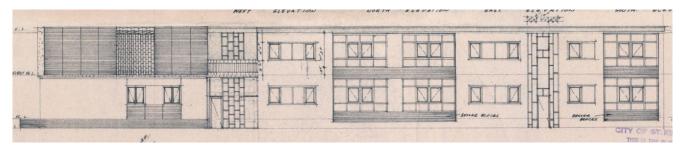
& 4 - East and north elevations, from drawings related to permit no. 57/2966 (M Feldhagen, 1963) (Source: Council Building File)
